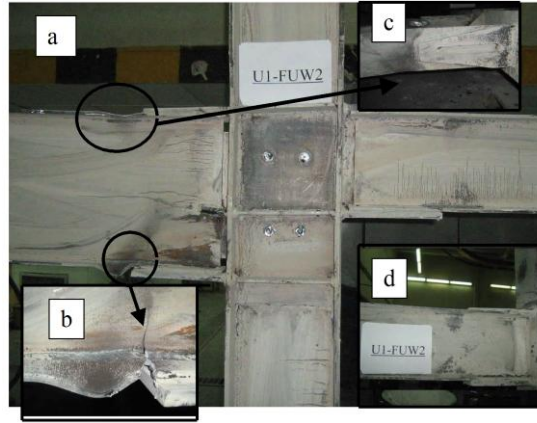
(a) View of specimen U1-FUW2 erected after the experiment and flaking of whitewashed area at deep and shallow beam and PZ upper segment (rear view) (b) deep beam bottom flange fracture (rear view) (c) deep beam top yielding area (top view) (d) flaking of whitewashed area at the shallow beam (front view)
